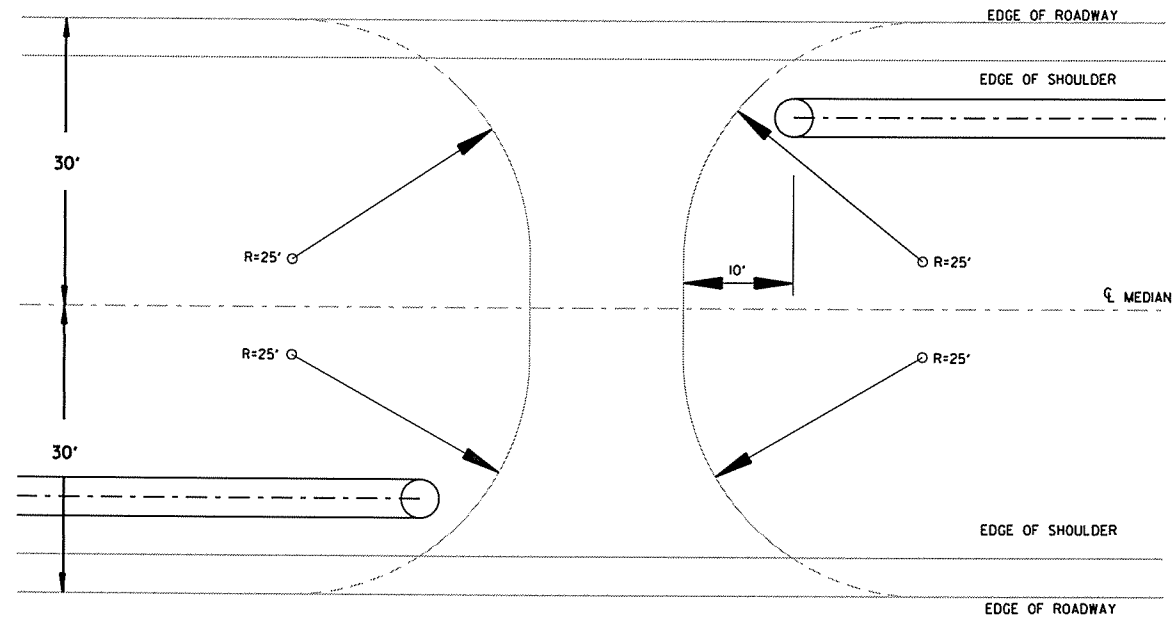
DETAILS OF SHOULDER WIDENING FOR GUARDRAIL AND OVERLAPS WITH ENDS OF WIRE ROPE SAFETY FENCE
